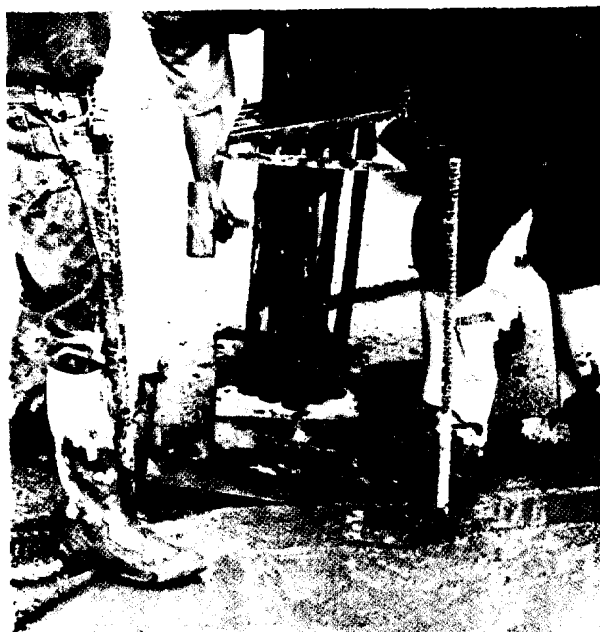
Placing wedge anchor plate, Interstate Highway I-96 retaining wall, Detroit
